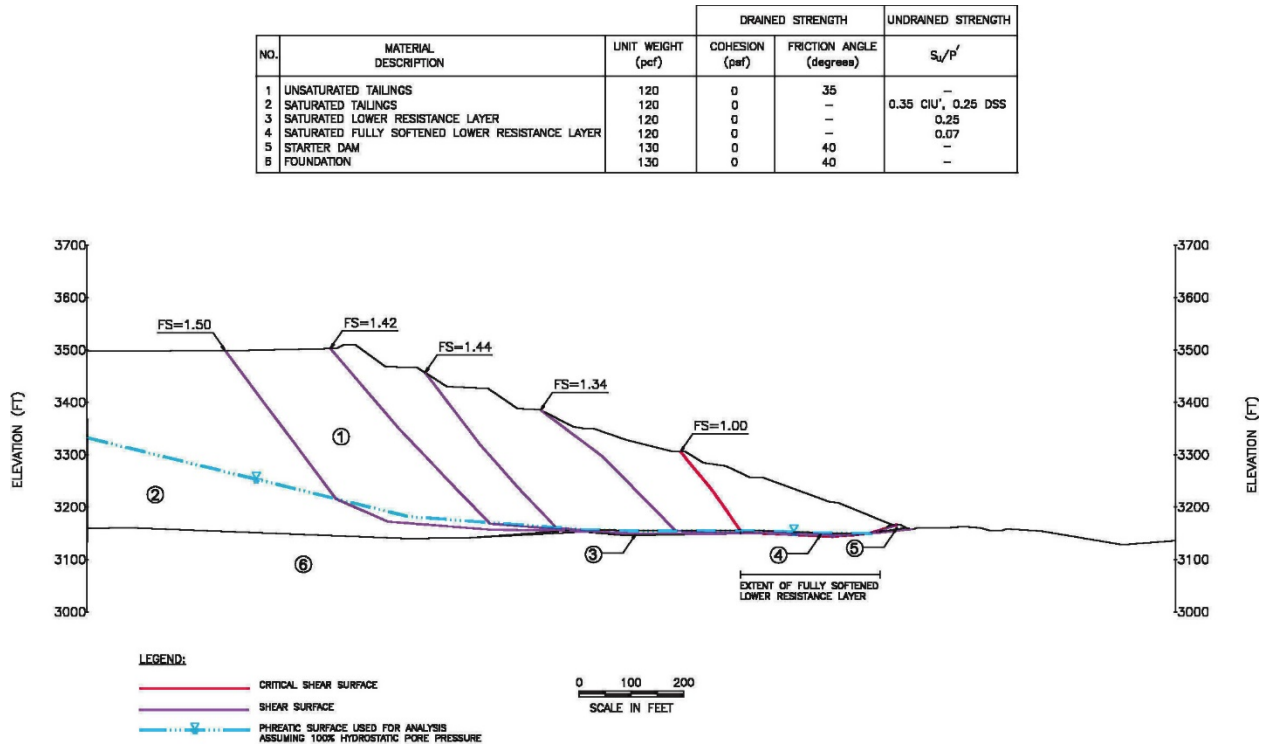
Section 8, STI elevation 3,510 feet amsl, undrained stability results without buttress
